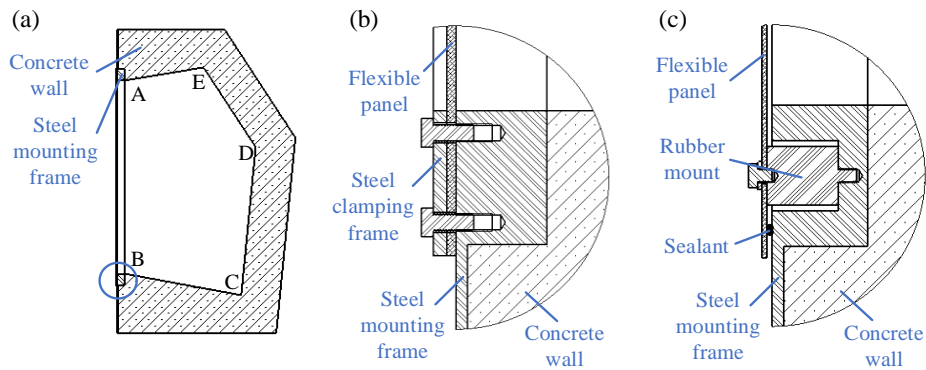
Design for the mounting of flexible panel: (a) a steel mounting frame in the front; (b) realization of the rigid mounting; (c) realization of the elastic mounting.
